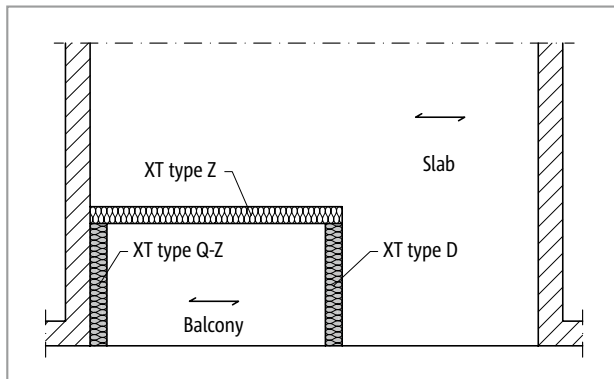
Schöck Isokorb® XT type D, Q-Z: One-way spanning
